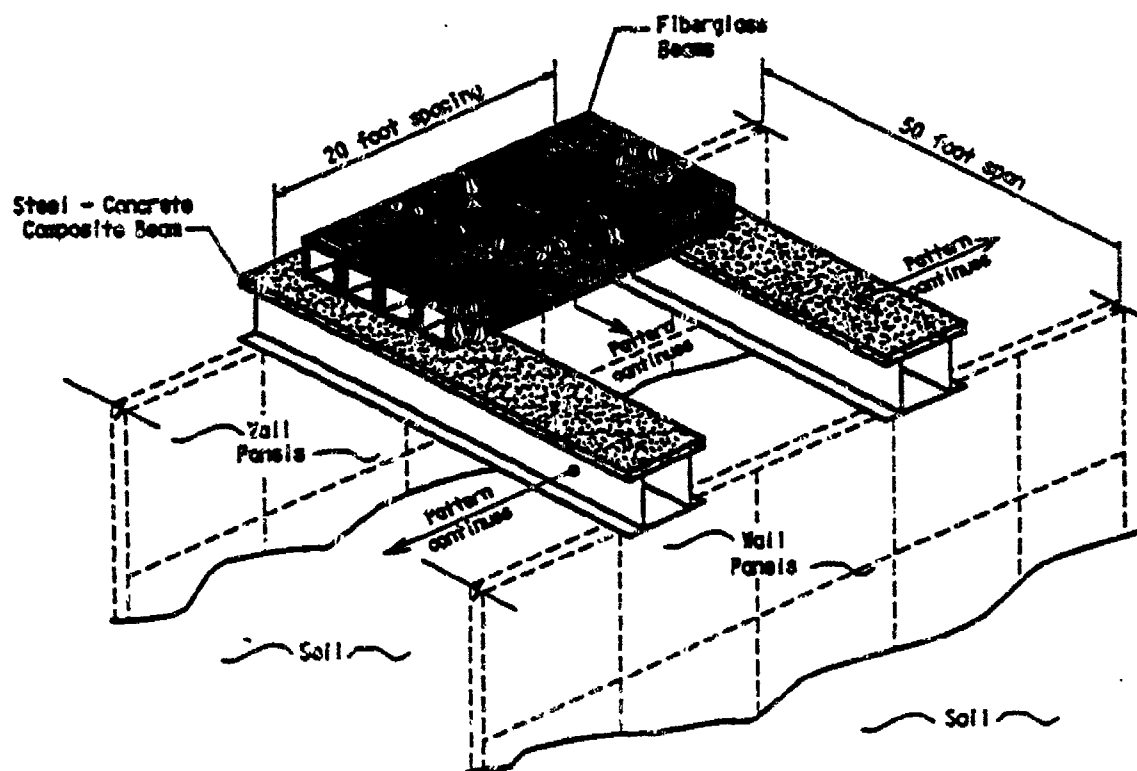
Proposed Lightweight Two-Way Roof System Using Pultruded Fiberglass Beams.
